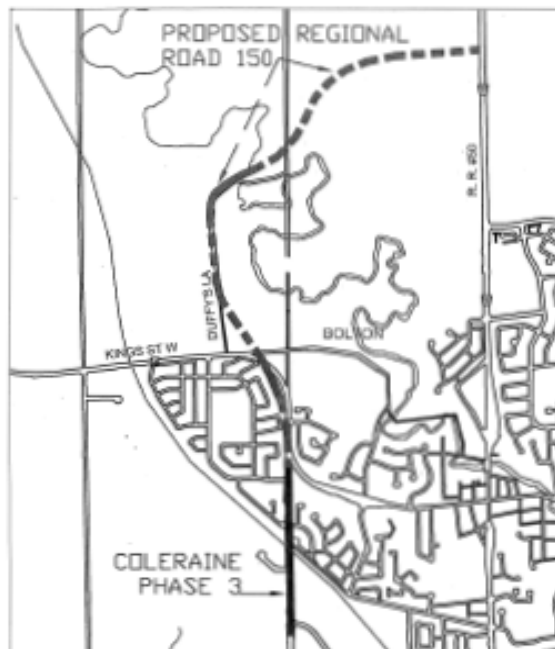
Key Plan of Proposed Bolton Arterial Road Stage 2 – Regional Road 150
